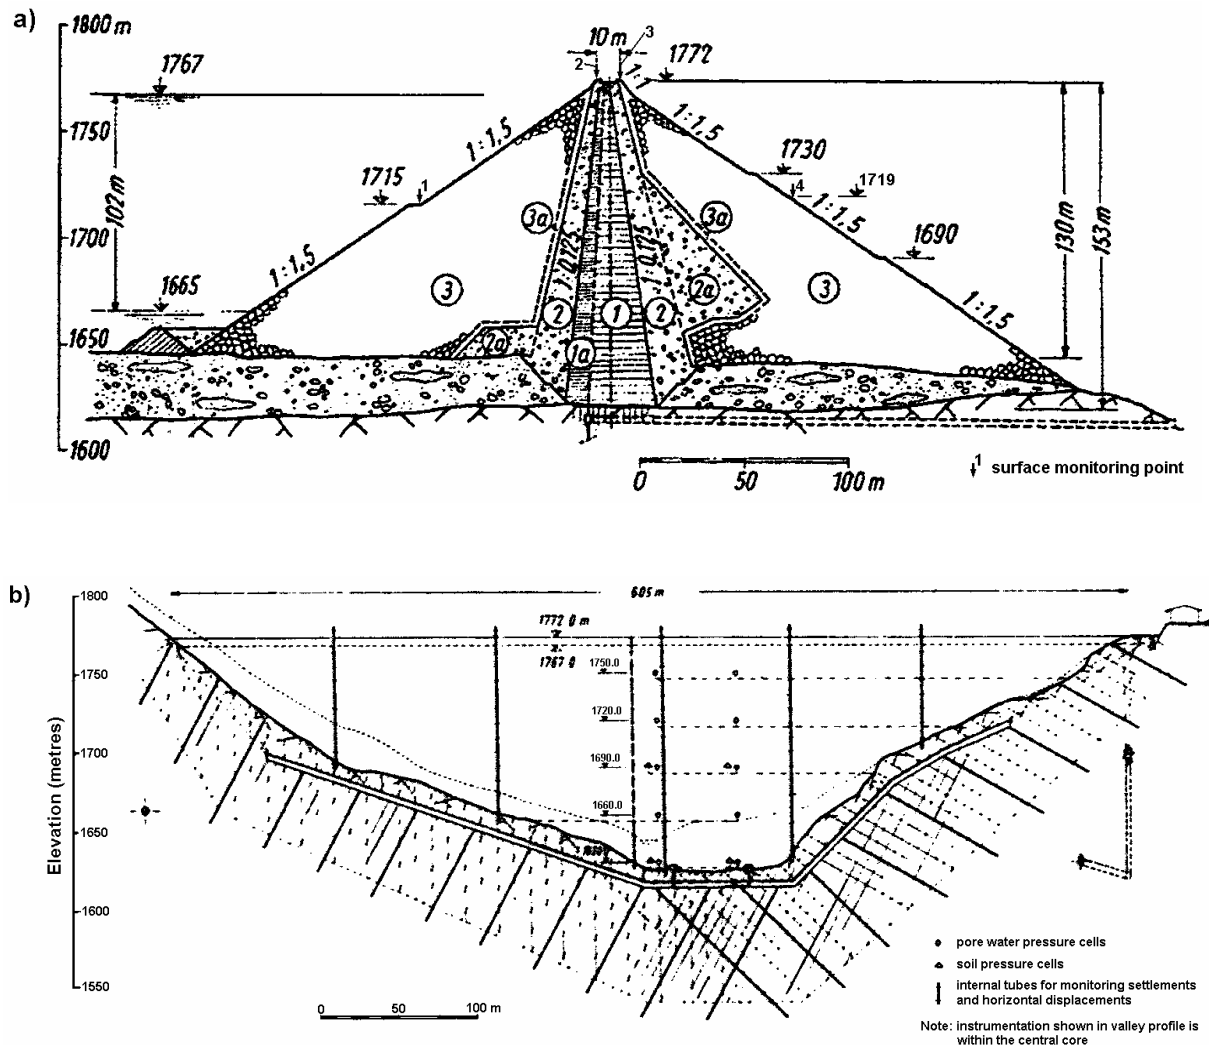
Gepatsch dam, (a) main section (Schober 1967), (b) longitudinal section along dam axis (Lauffer and Schober 1964).
